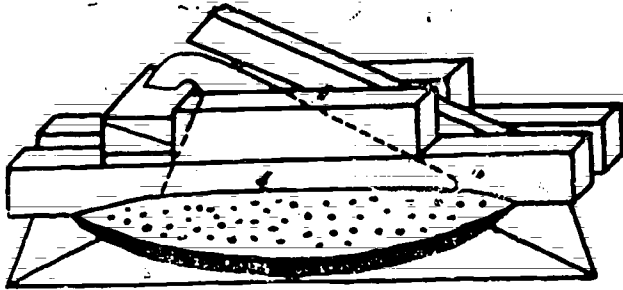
Concrete slab has been poured; part of the exterior sectional mold has been placed in its position.
